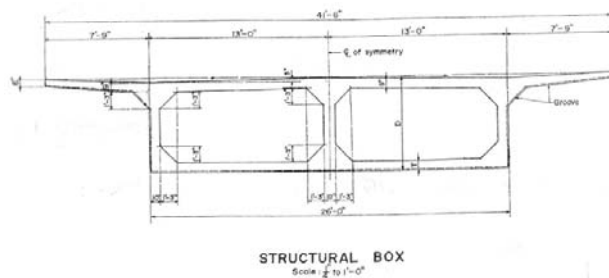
Deck cross section of Sultan Azlan Shah Bridge
